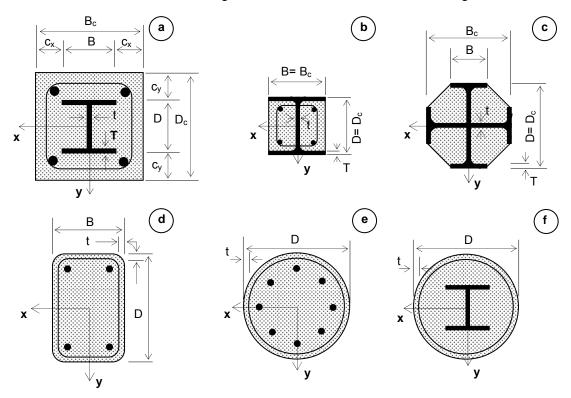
Typical cross-sections of doubly symmetrical composite columns
